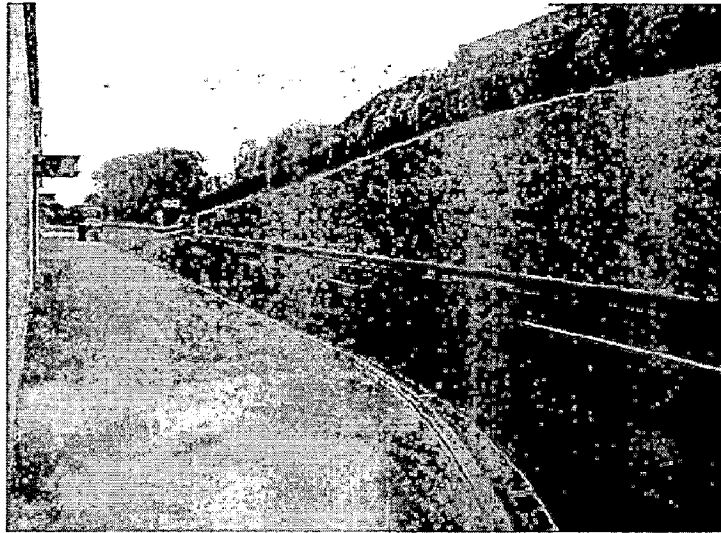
Long blank walls and barriers are not conducive to safe walking.
